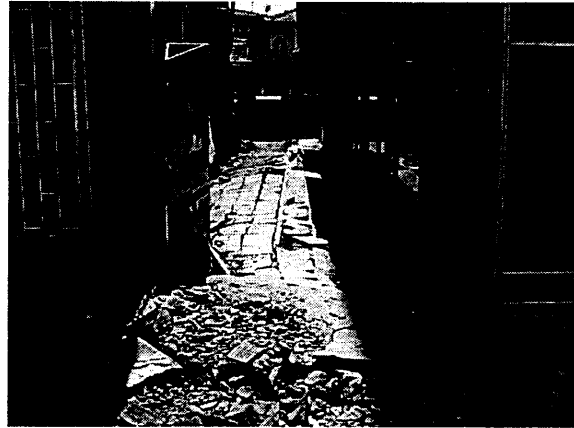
Ground distress and bulging between building E1 and the building located to the west (08/25/1999)
